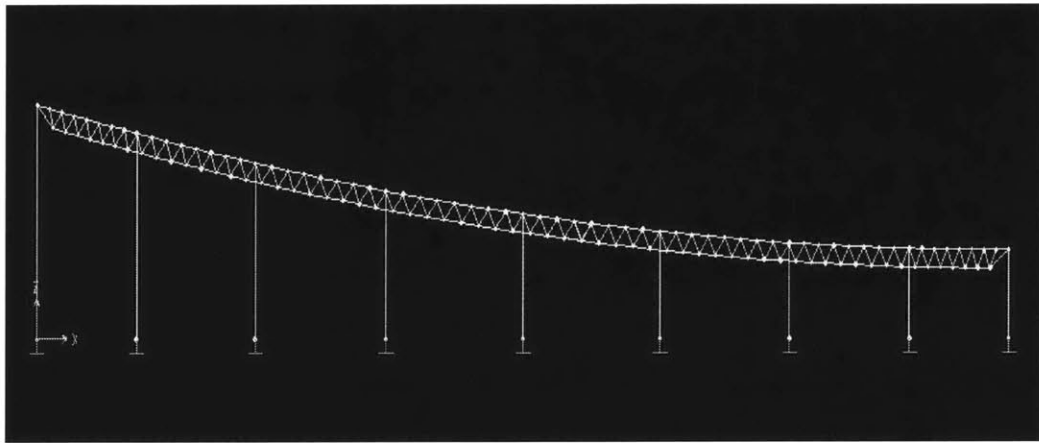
ELEVATION VIEW IN SAP
